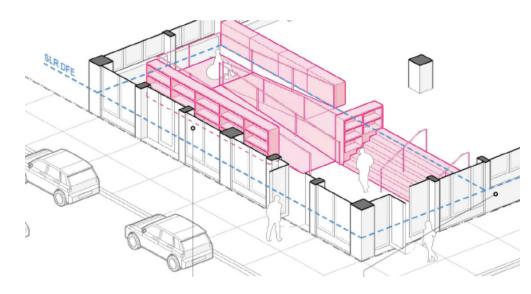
Flood Zoning Design Guidelines - Wet Floodproofing
